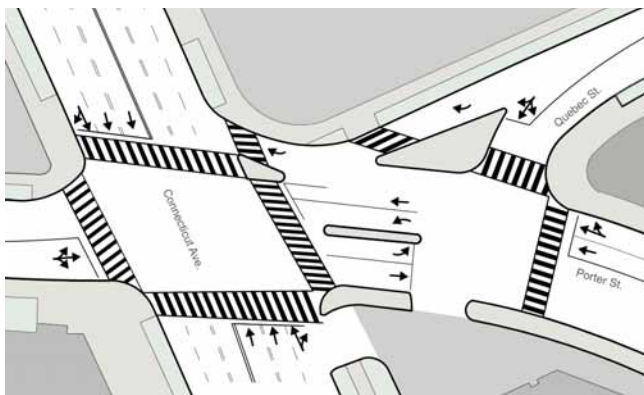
Existing Connecticut Avenue and Porter Street Intersection (Source: Arup)
